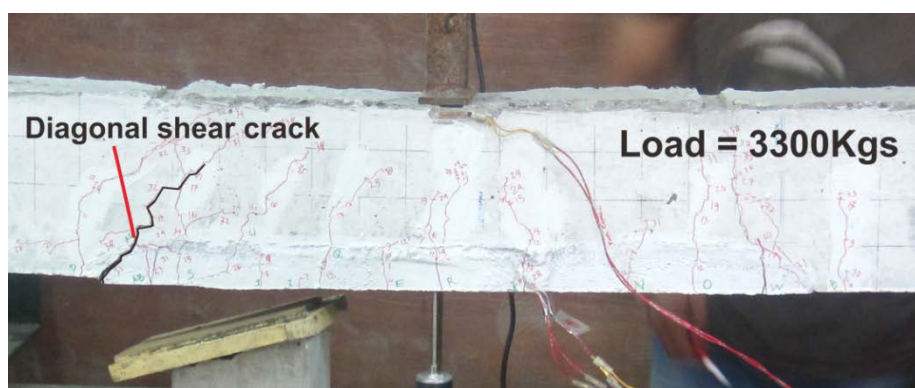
Diagonal shear crack development of S7 Ultimate-2 specimens (no horizontal crack occurs)
